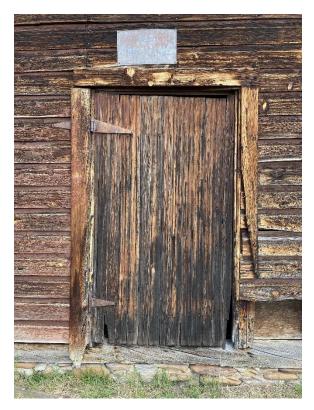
Photograph of representative door on the north elevation, showing door type, casement, and the uncut stone foundation.
